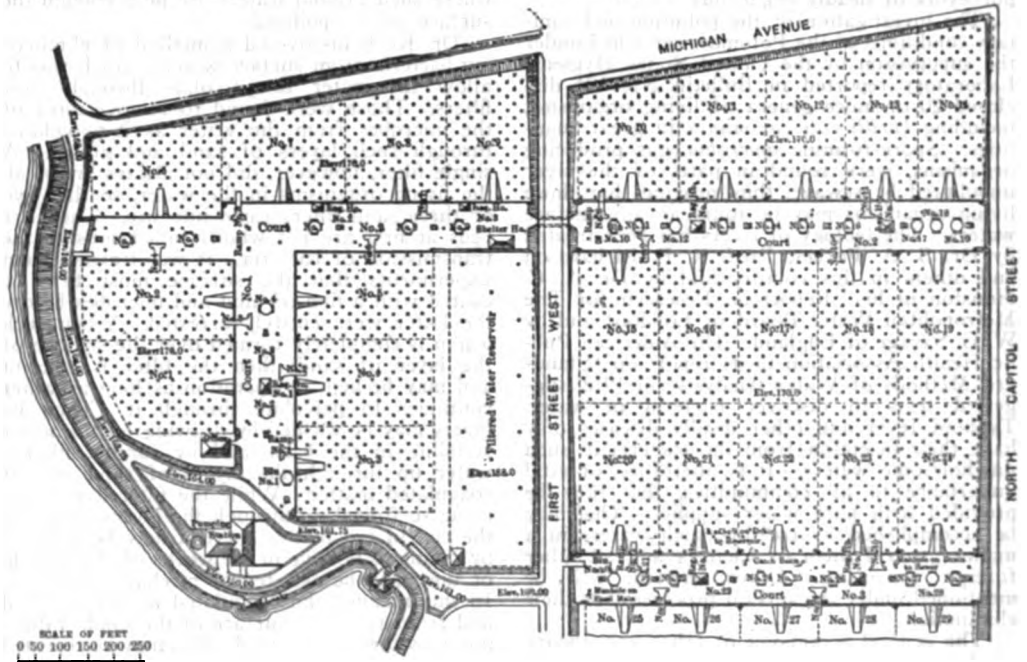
General Plan of Filtration Plant, Washington, D. C.
